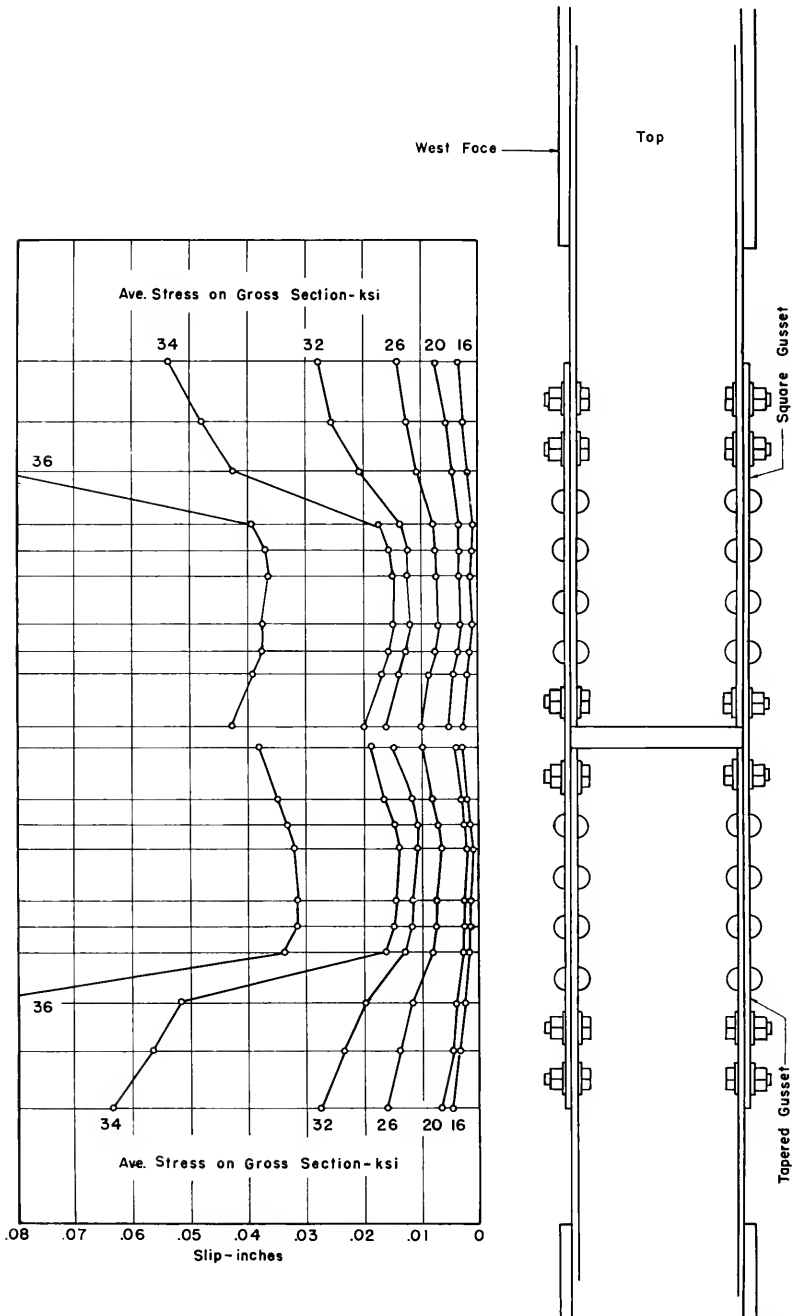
SLIP DISTRIBUTION ALONG RIVETED AND BOLTED JOINT - WEST FACE
